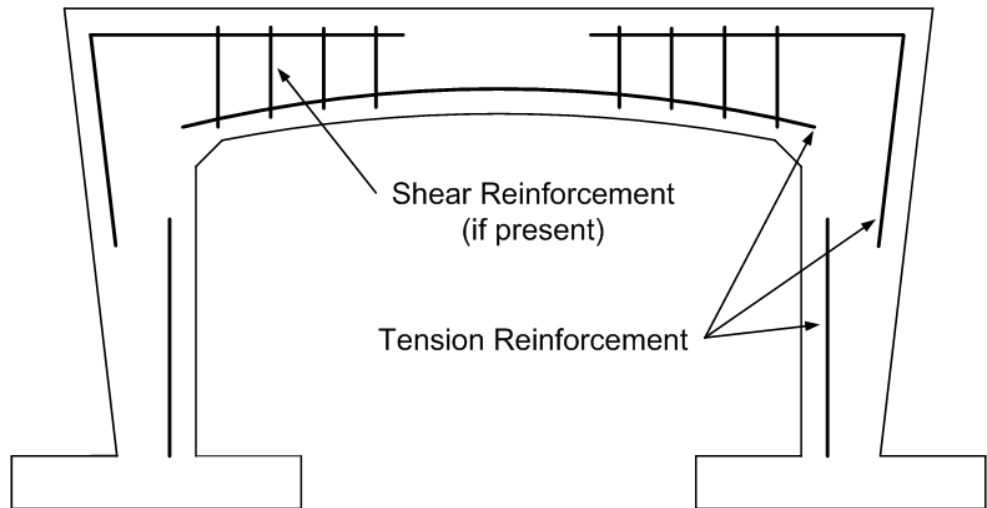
Primary Reinforcement in a Single Span Frame
